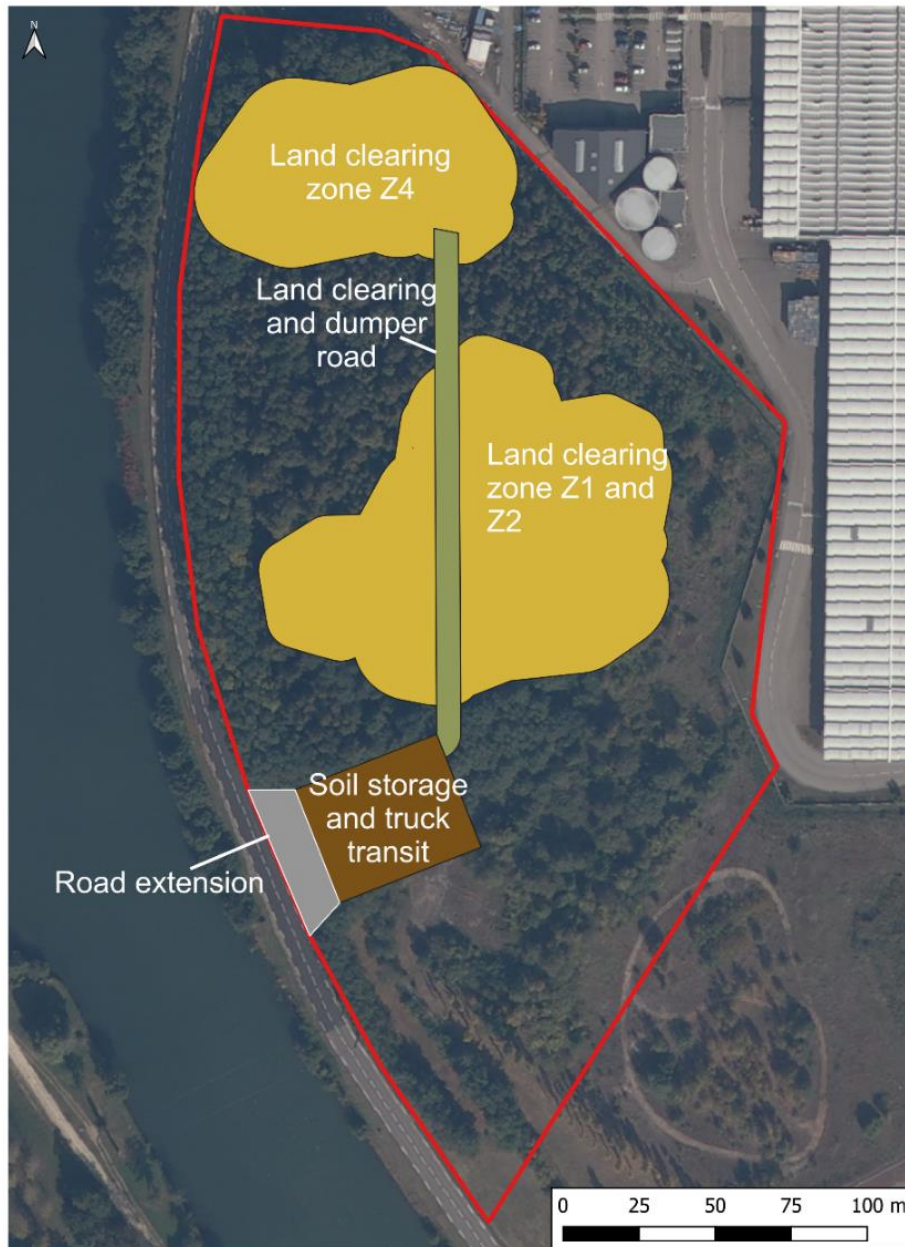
Preparatory work to be carried out and dedicated areas before excavation can begin.
